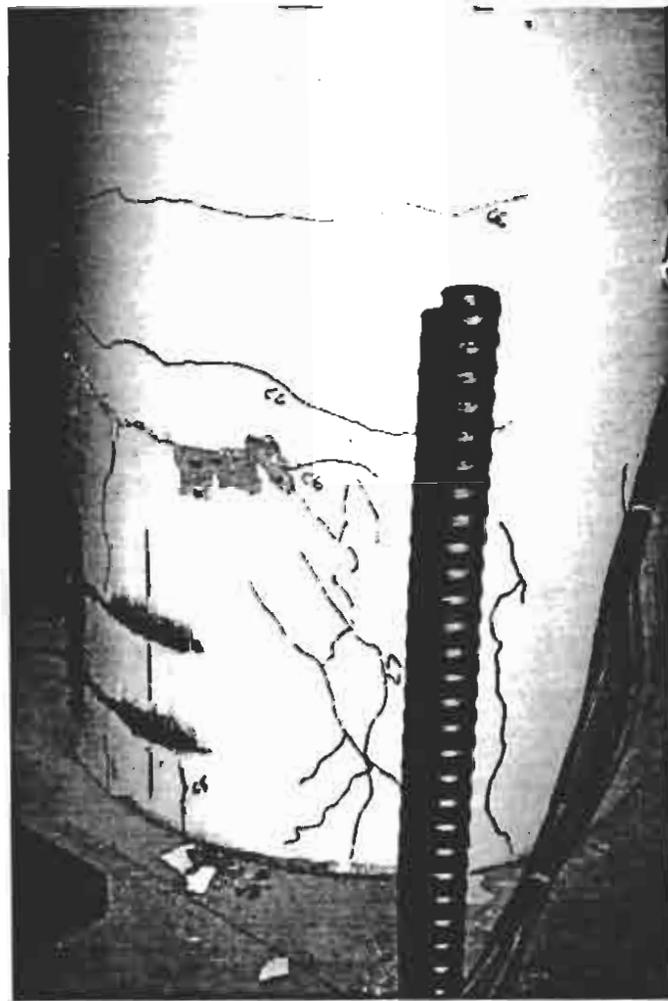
Failure of As-built Lap Splice Enhancement Circular Column
